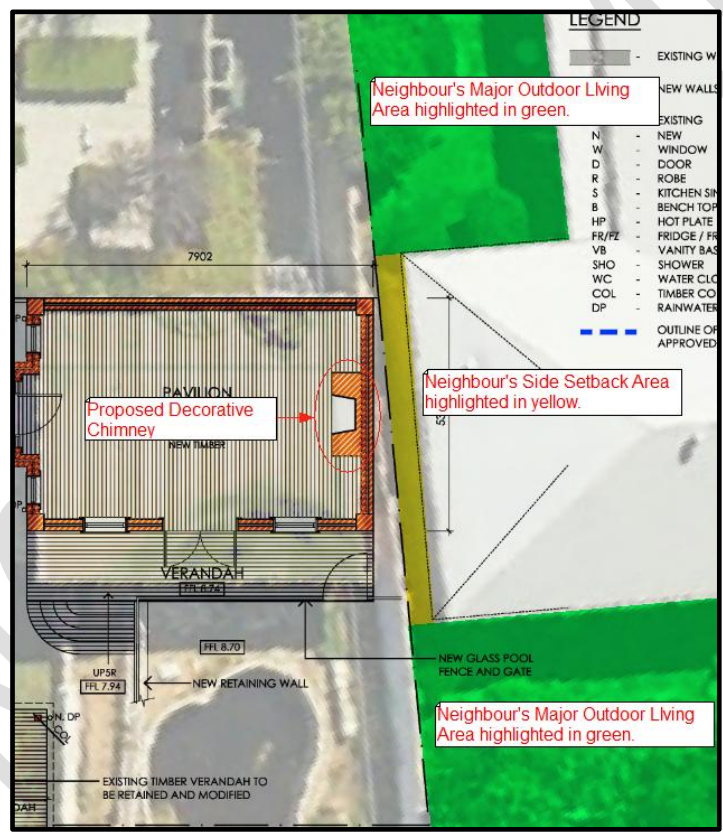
Relationship Between Proposed Pavilion Chimney and Adjoining Outdoor Living Areas
